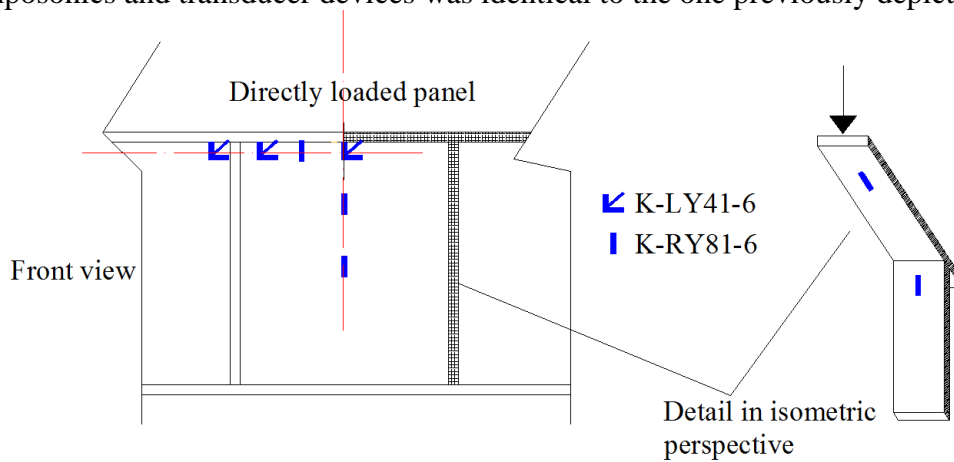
Frontal and isometric views of the web in the directly loaded panel
